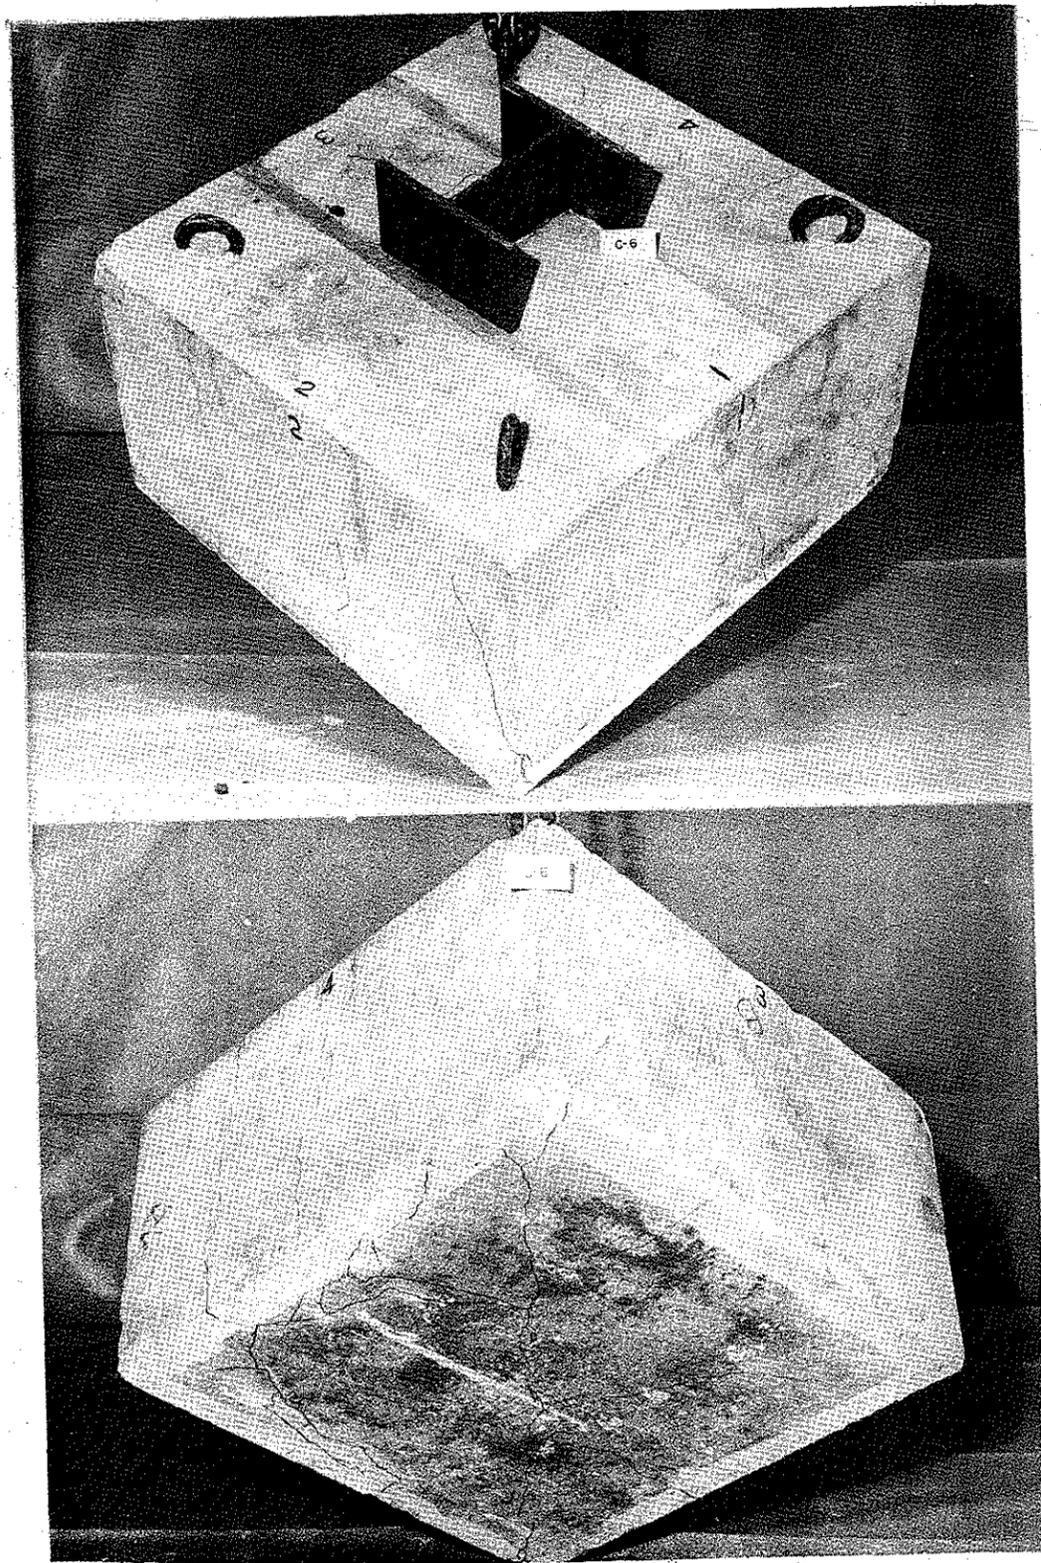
APPEARANCE OF SPECIMEN C-6 AFTER TESTING.
